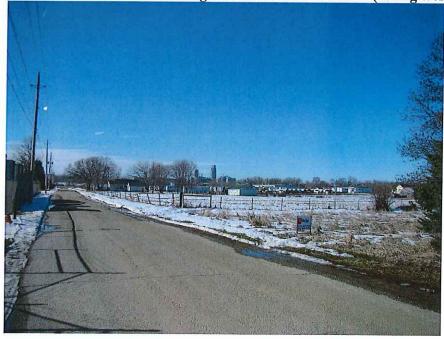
Exhibit C: View of the existing condition of 16th Avenue (facing west)
